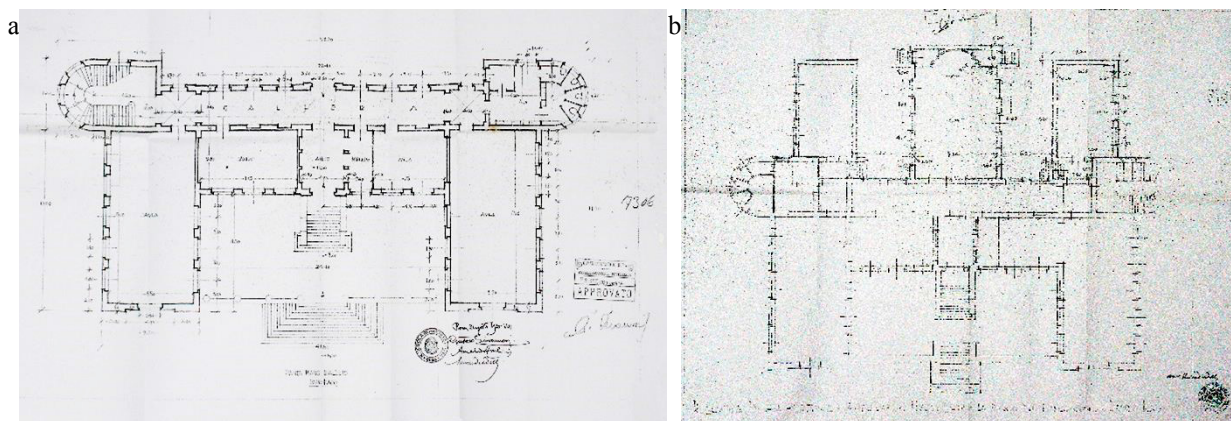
(a) original plan; (b) plan with the first volumetric addition.
